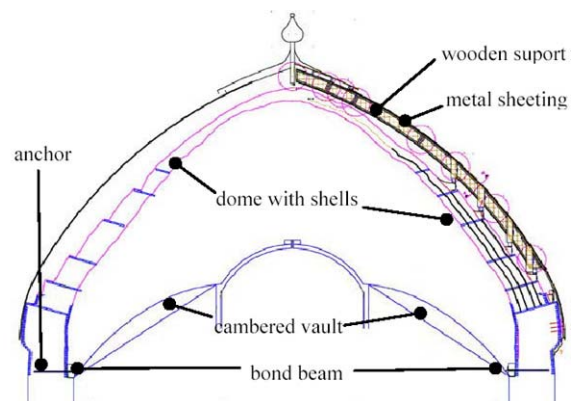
The repair solution with bond beam, wooden support and metal sheeting.
